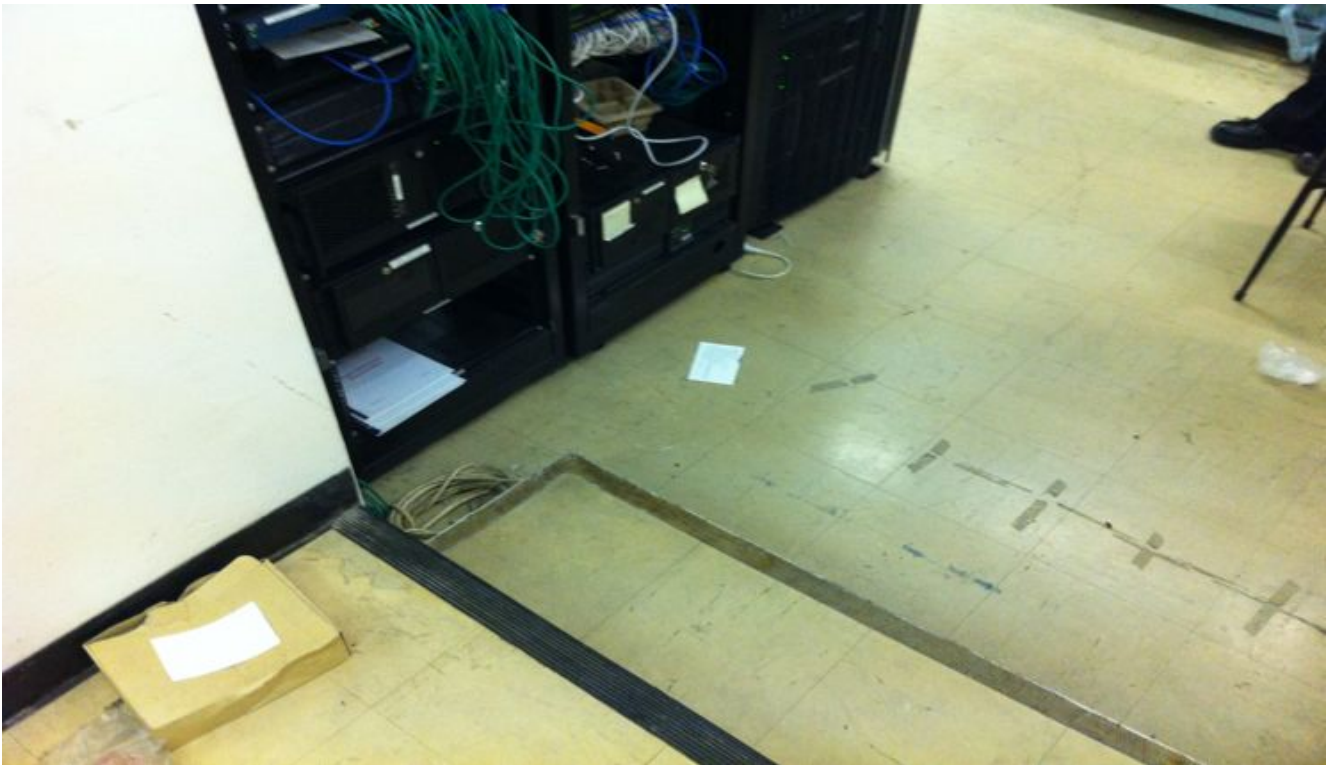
Vinyl floor tiles containing asbestos within the Movie Link/Commas Room on the Lower Ground Level of the North Wing – Menzies Hotel..
